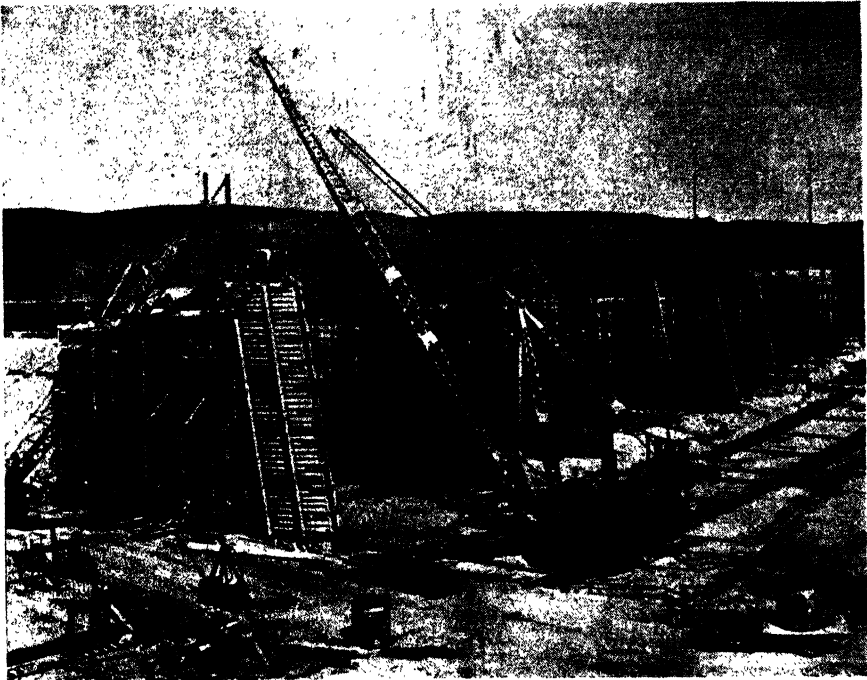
Stiff-Leg Derrick and Tractor Boom Casting Concrete. (Courtesy American Hoist and Derrick Co.)
